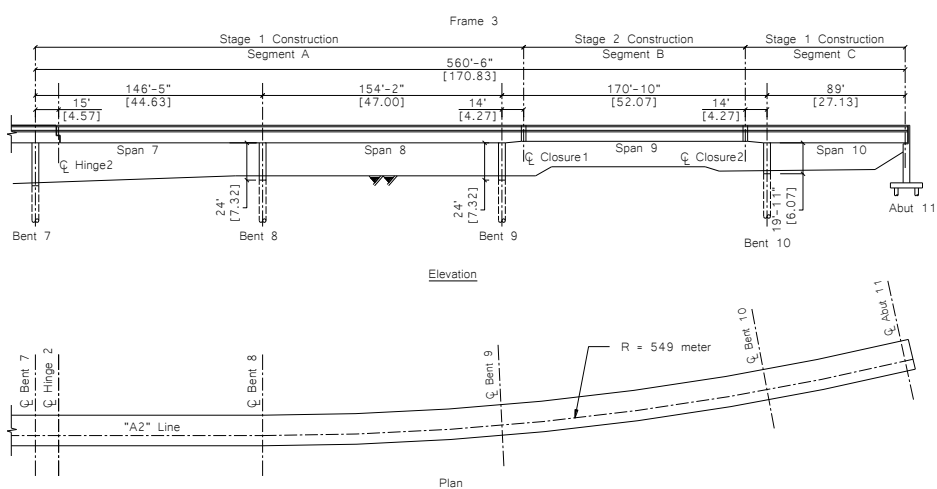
Elevation of Frame 3, Bridge 5EB
